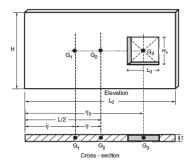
Geometry of wall openings in elevation and cross-section plan [8].
